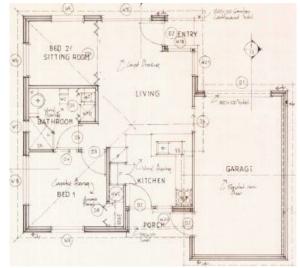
Floor Plan of Block B,C,D,E - Units 7,12,14,16.
